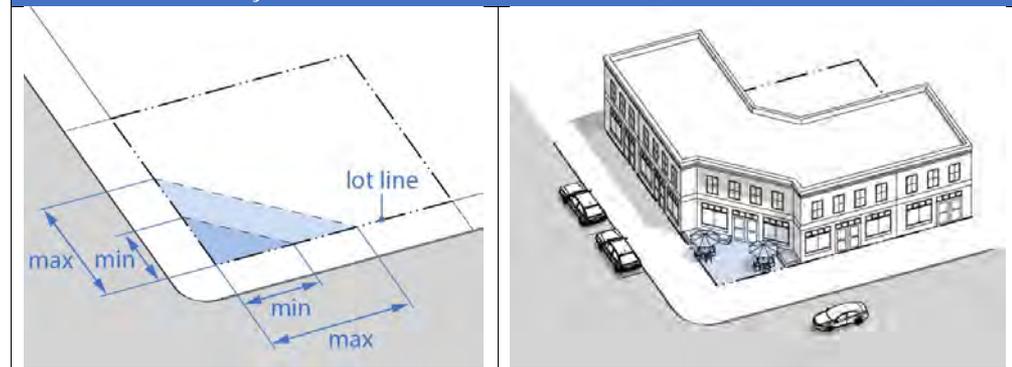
FAÇADE ORIENTATION AND CORNER LOT SITE CLEARANCE
